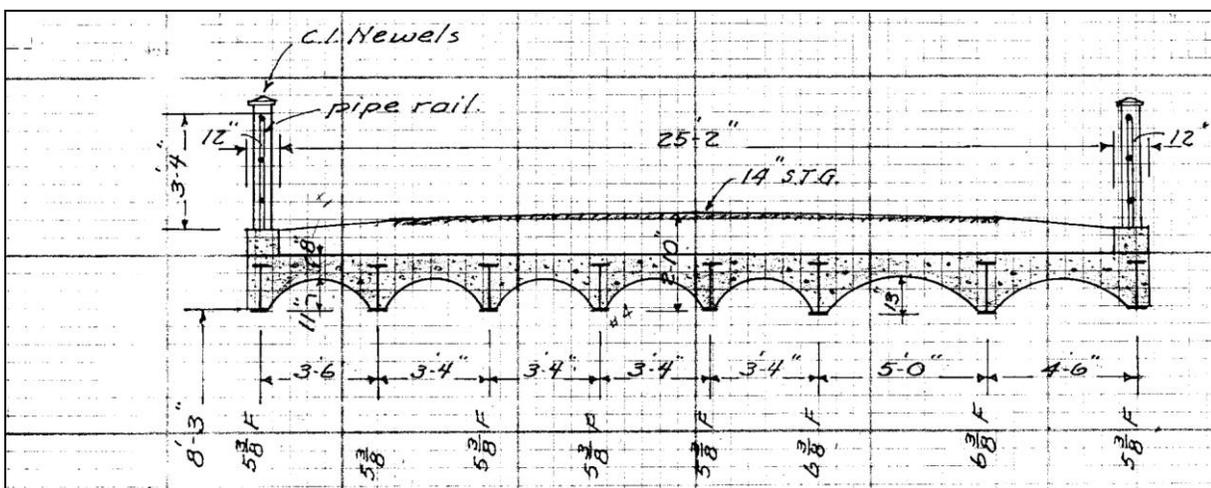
Bow 135/160 Turkey River Bridge (1911). Section drawing (NHHD Bridge Inventory Card).
